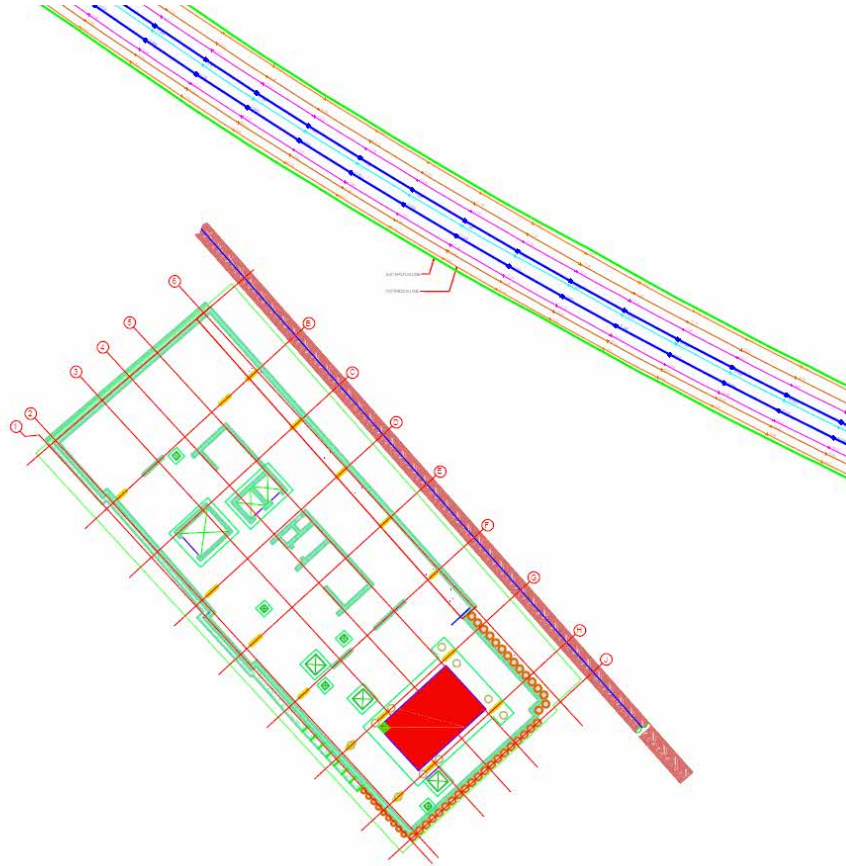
Crossrail Asset overview layout plan relative to proposed development
